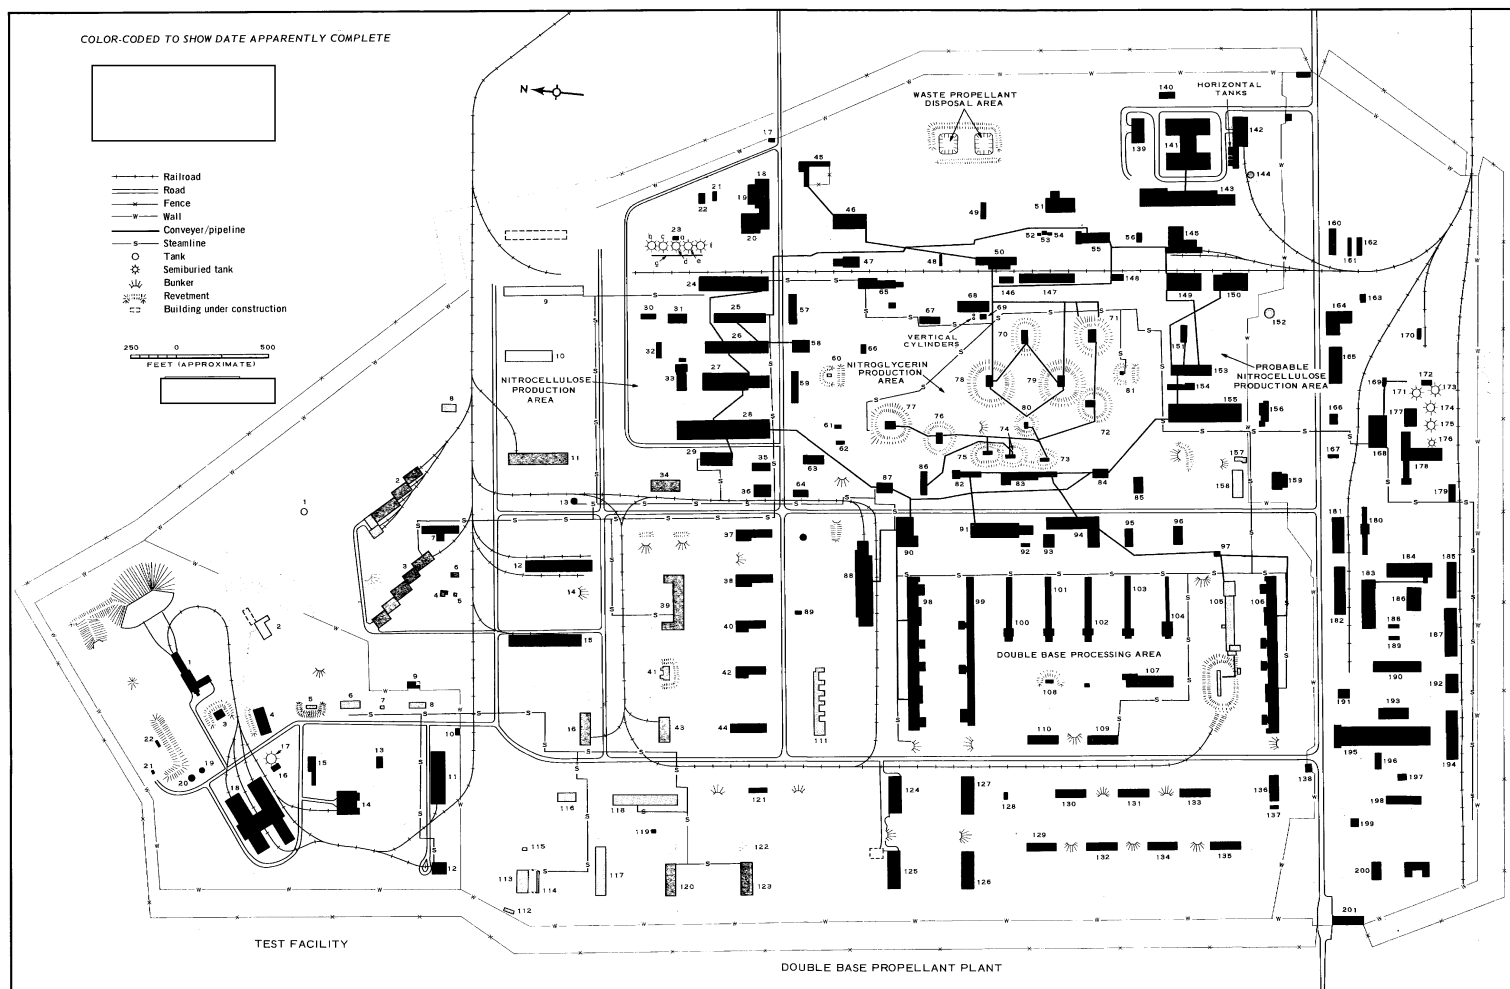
LAYOUT OF DOUBLE BASE PROPELLANT PLANT AND TEST FACILITY.
